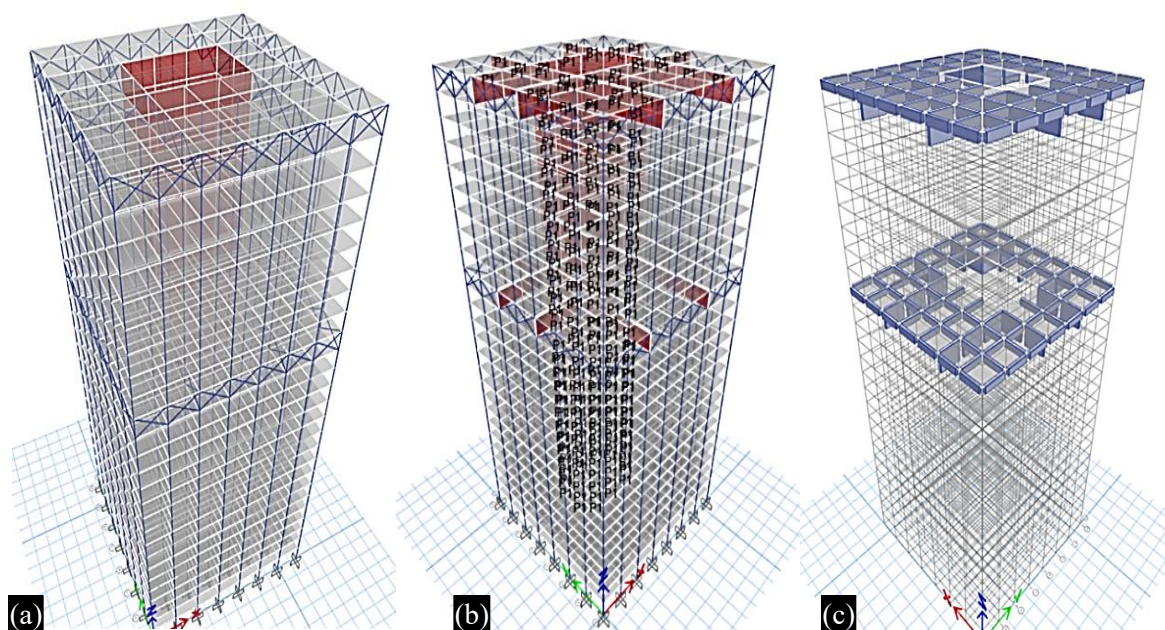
3D view of outrigger at top: (a) bracing, (b) shear wall, and (c) deep beam.
